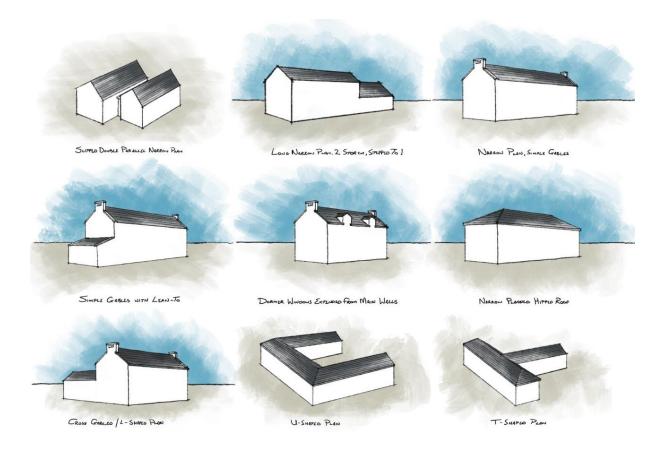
Examples of appropriate house building forms in the countryside e.g. narrow plan, low eaves, modest scale, flat fronted, and vertical emphasis to gables.
